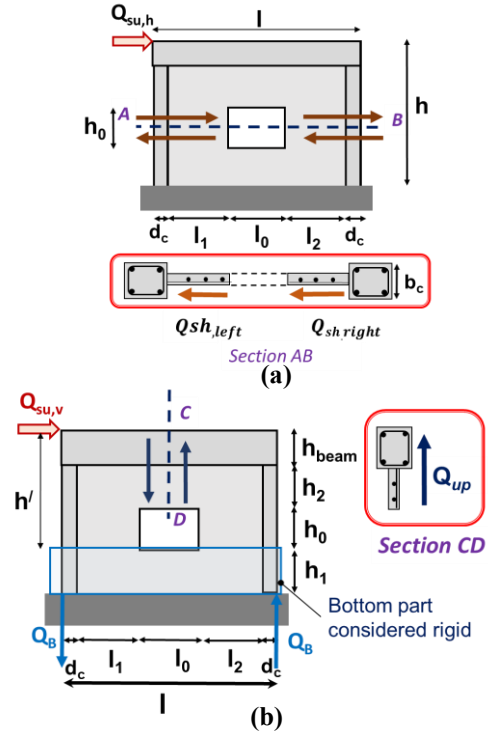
Shear strength of wall with opening considering (a) horizontal (b) vertical shear
